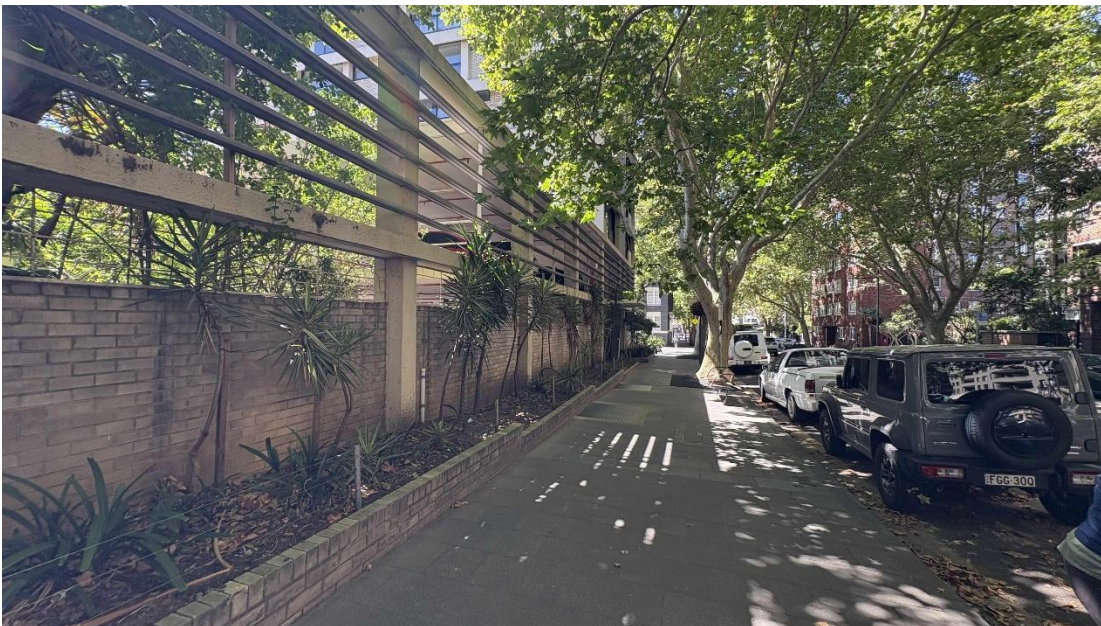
Subject site from Macleay St (subject site on left) (Photo taken: 24/01/2026)
